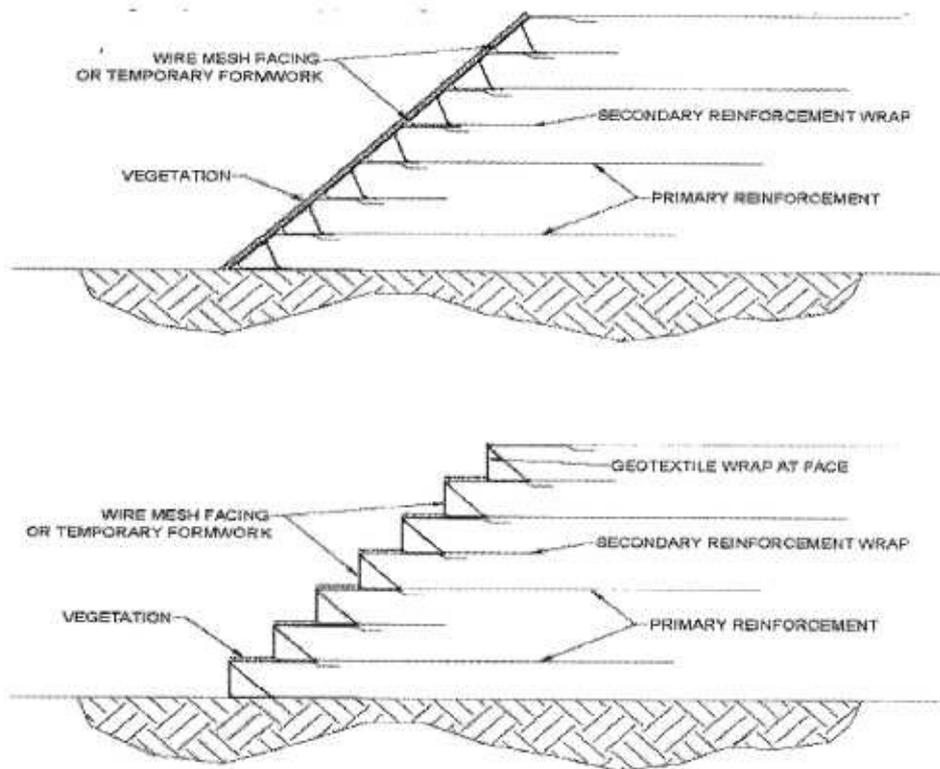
Alternative Methods of RSS Construction (from TenCate™ 2010a)
